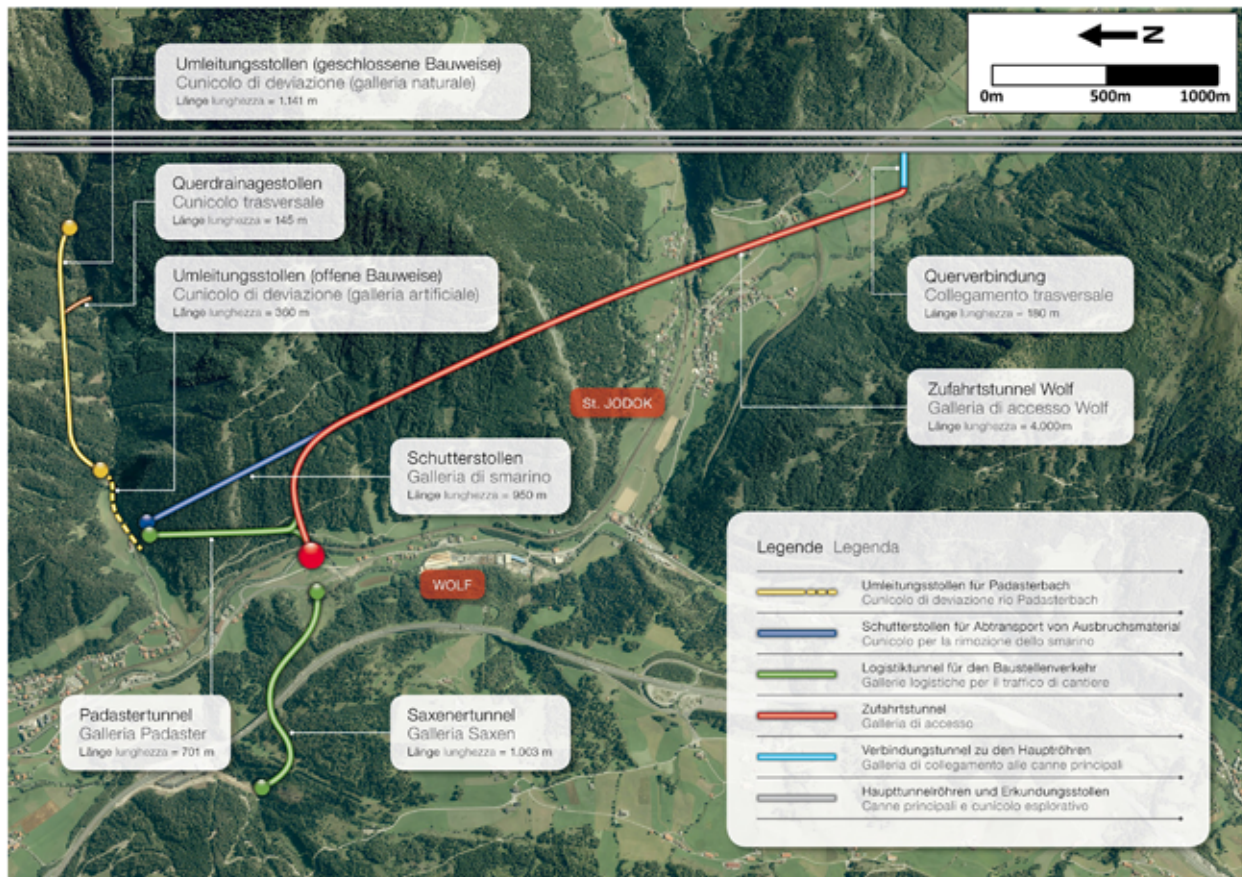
The construction site at Wolf: Brenner base tunnel (white), access tunnel Wolf (red), Padaster tunnel and Saxener tunnel (green), bulk tunnel (blue) diversion tunnel -closed construction (yellow), diversion tunnel -open construction (yellow dotted), main tunnels (grey).
